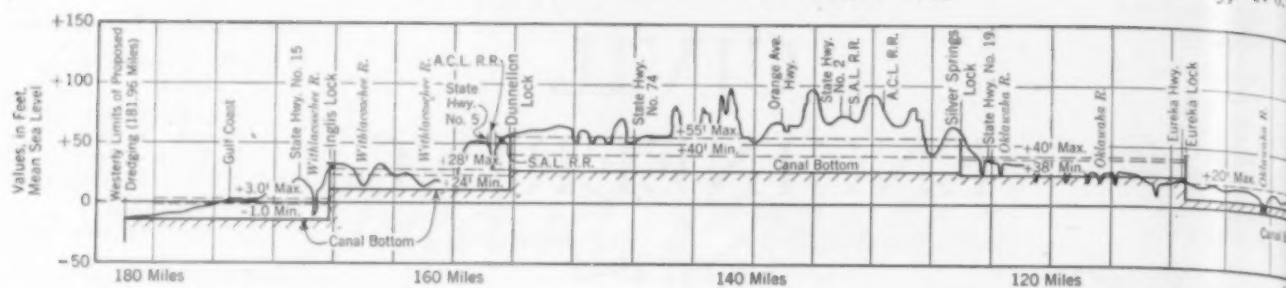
PROFILE OF THE CANAL INDICATES CONSIDERABLE EXCAVATION
